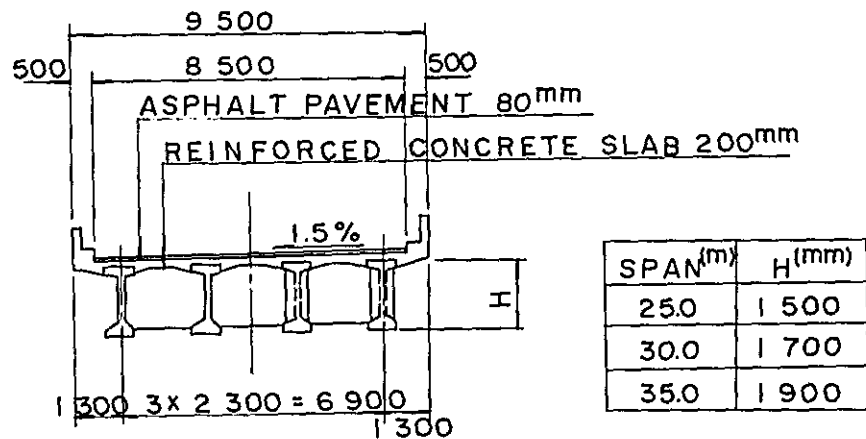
Typical Cross Section of Simple Composite Girder
